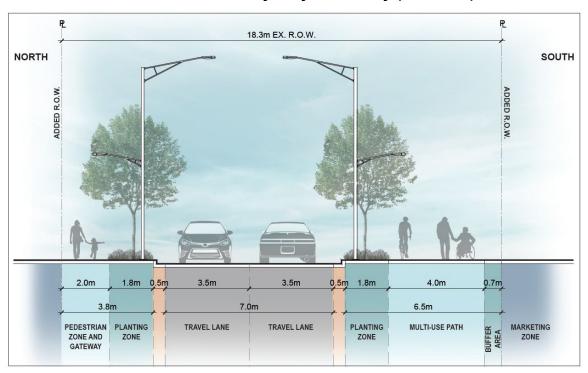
Bridge Street Alternative Solution Cross-Sections
